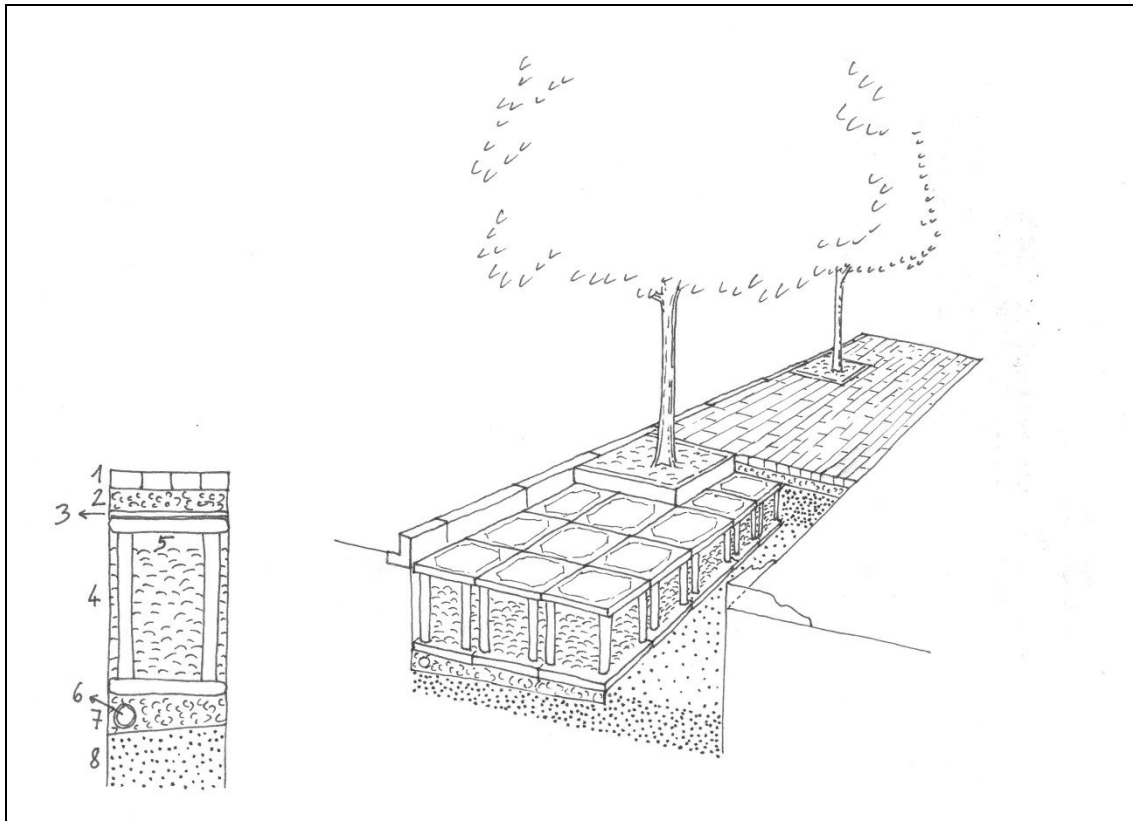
Example of use of soil cells in street avenue (5.12): 1 – pavement, 2 – gravel bed, 3 – geotextile, 4 – soil cell filled with cultivation substrate, 5 – ventilation gap, 6 – drainage, 7 – gravel bed, 8 – natural earth.
